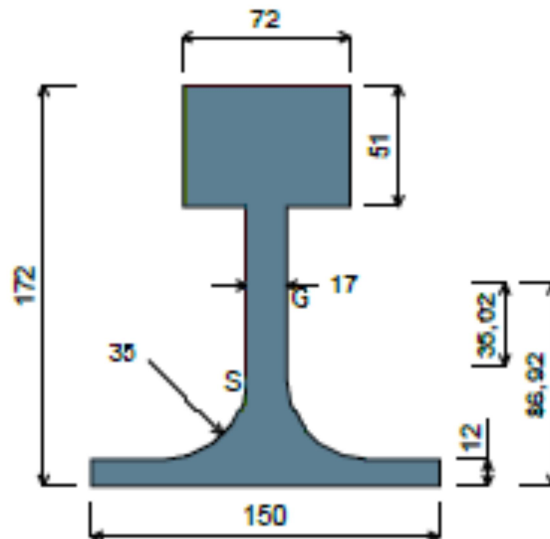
Simplified rail section in LTBeam (dimensions in mm).
